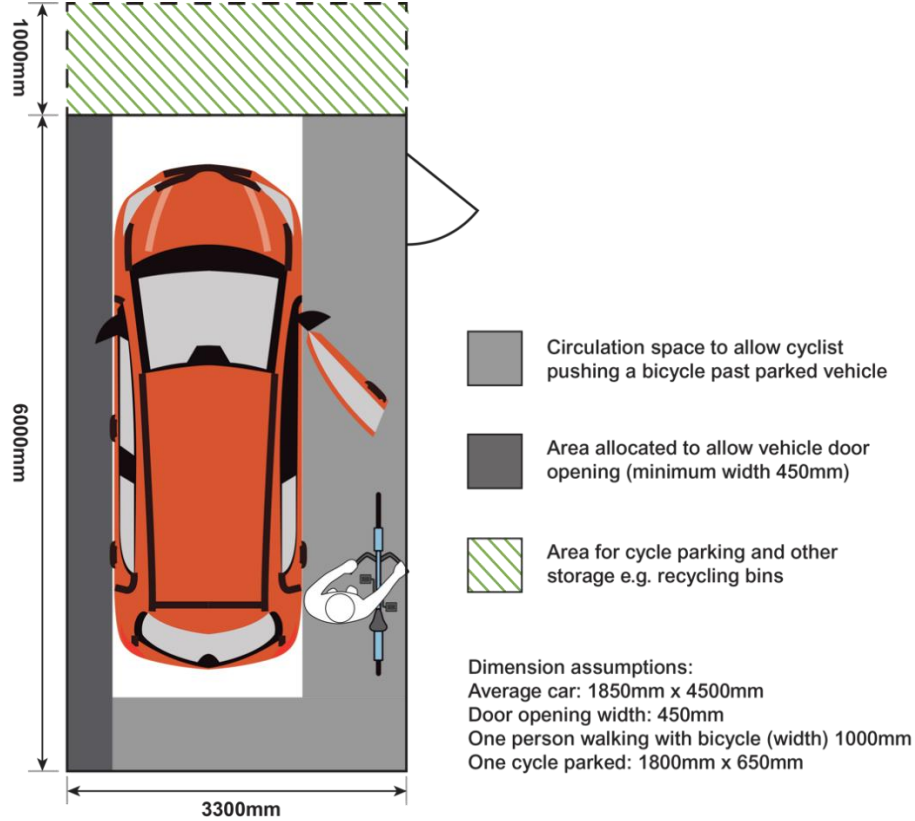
Minimum garage dimensions where parking for 2 cycles is also provided
